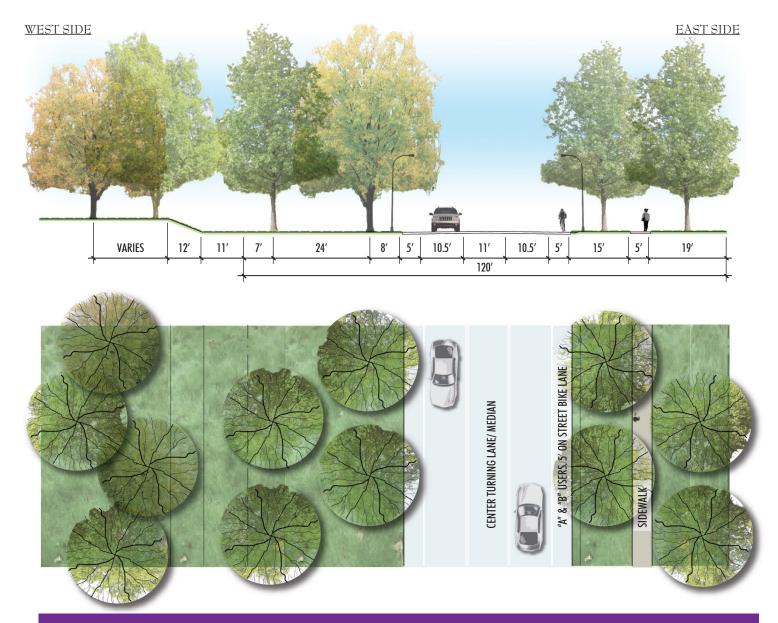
Southwestern Parkway: Zone 2 Existing Conditions Section & Plan - Chickasaw Park
